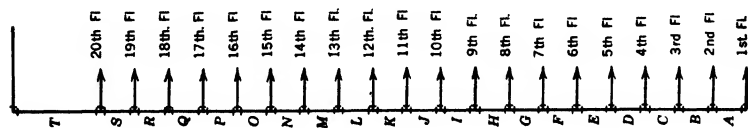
TYPICAL RISER FOR 20-STORY BUILDING
